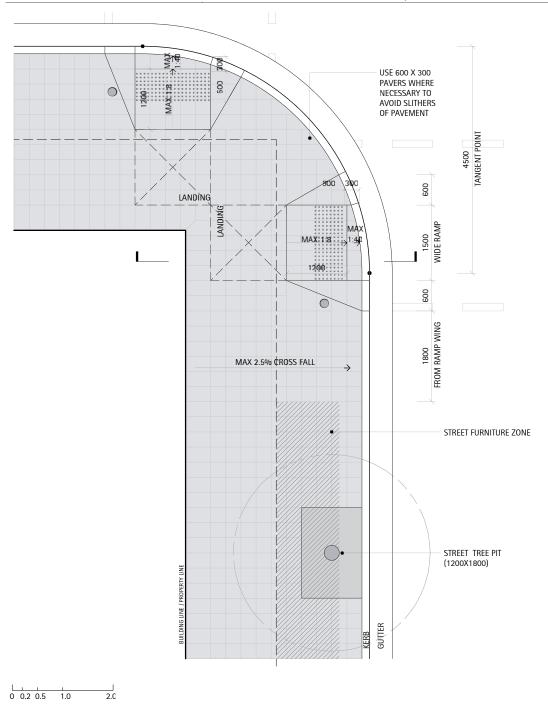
Streets Corner Plan: 4500 Radius 1500 Ramp
